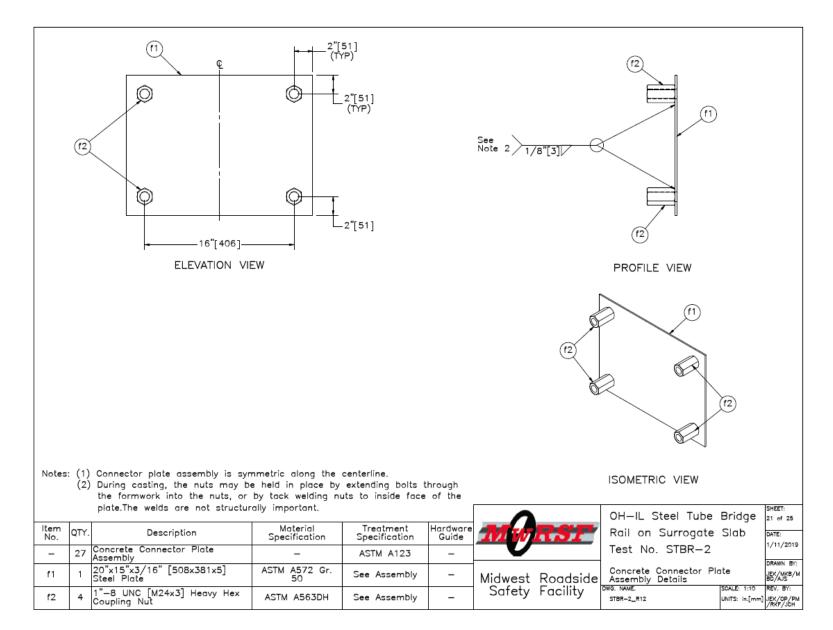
Concrete Connector Plate Assembly Details, Test No. STBR-2
